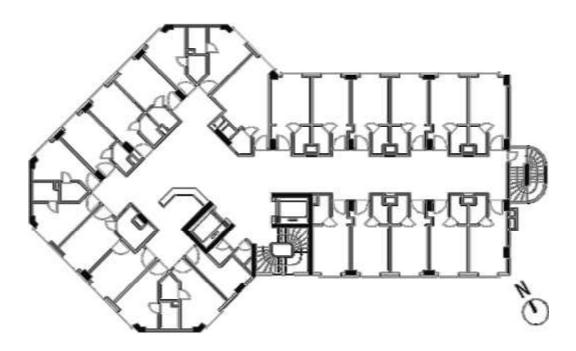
Floor plan of Case Study 2 building. Source: Architect (H. Şenol)
